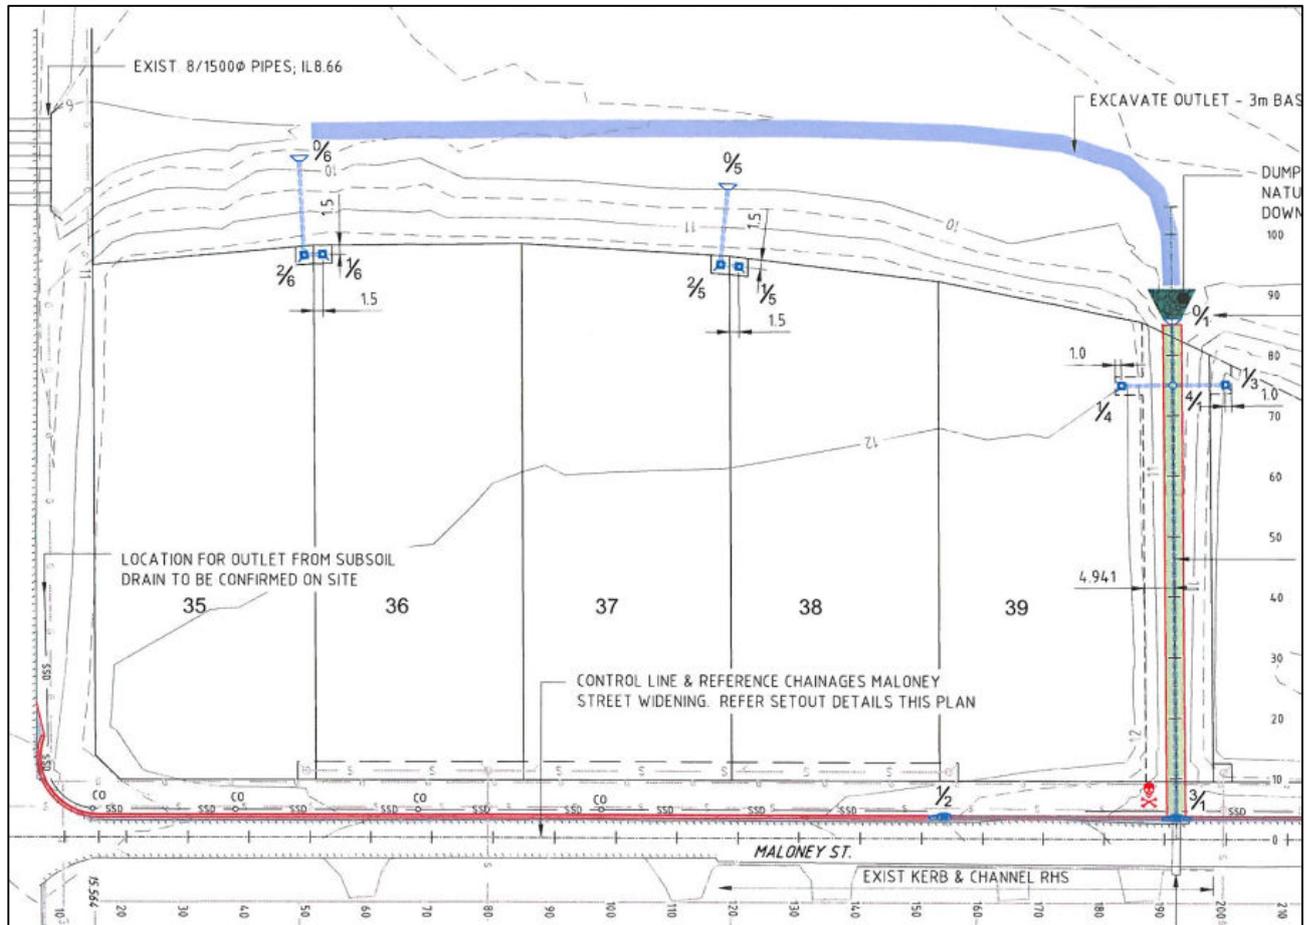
Extract of Approved Op Works Drainage Plan
